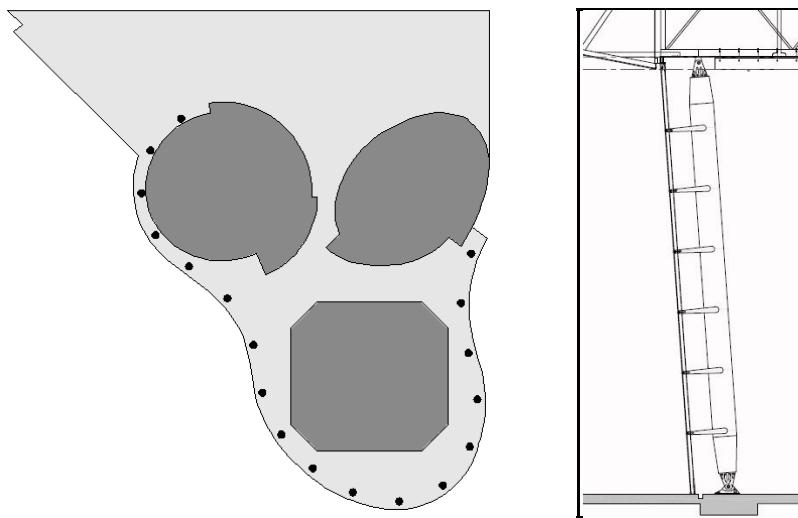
Plan view of the 18 columns (left) and an elevation of a column (right)
